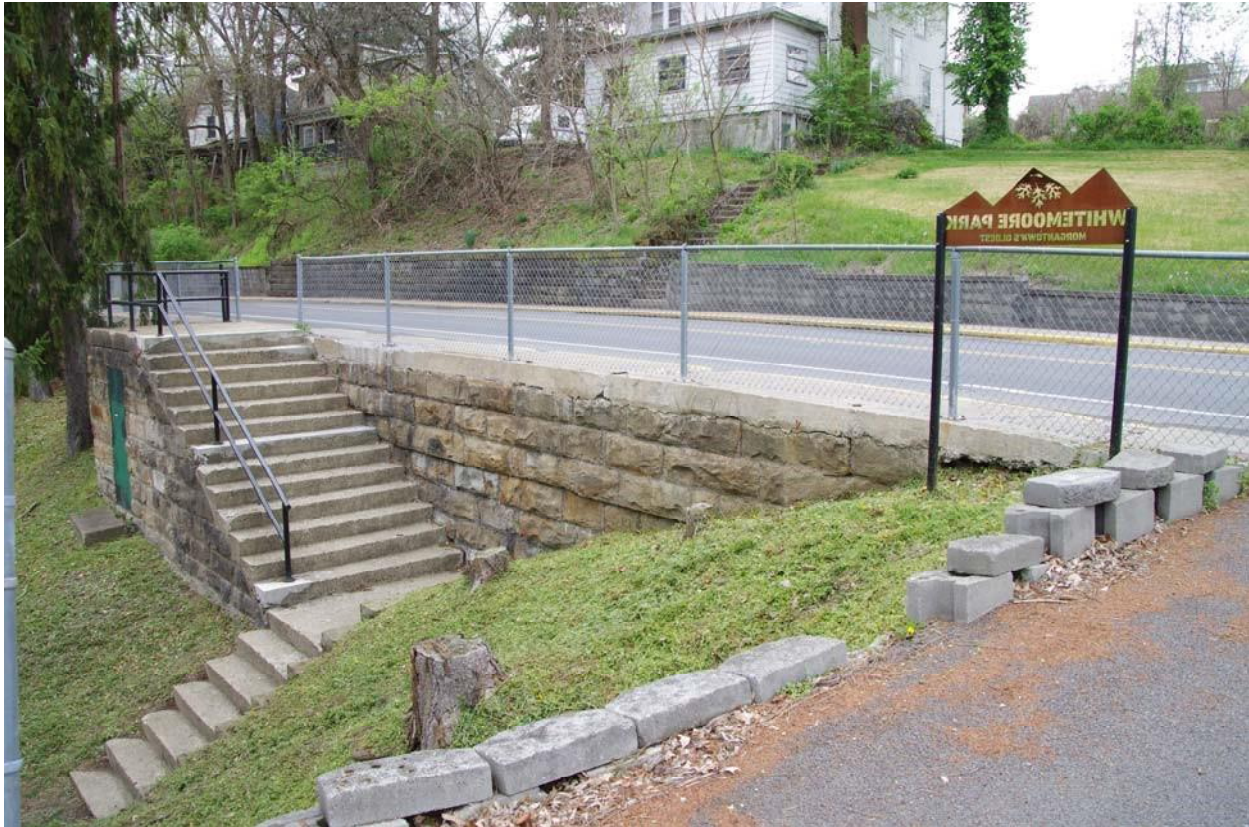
East end Richwood Ave Wall storage area and stairs facing north
